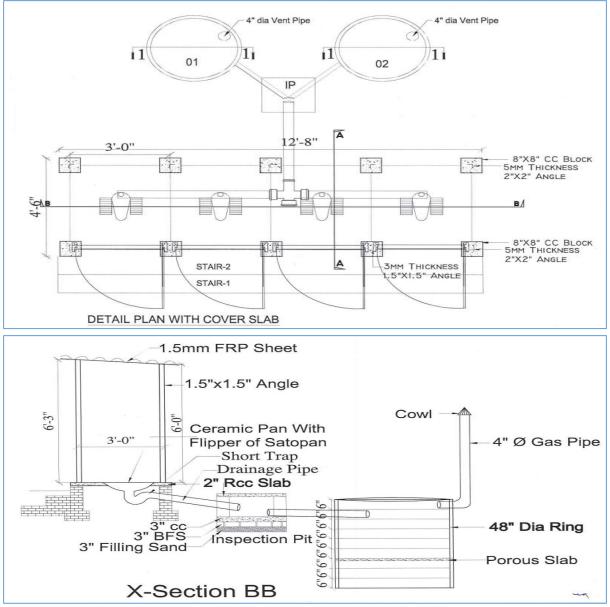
Plan and sectional view of Type-3 Biofil toilet
